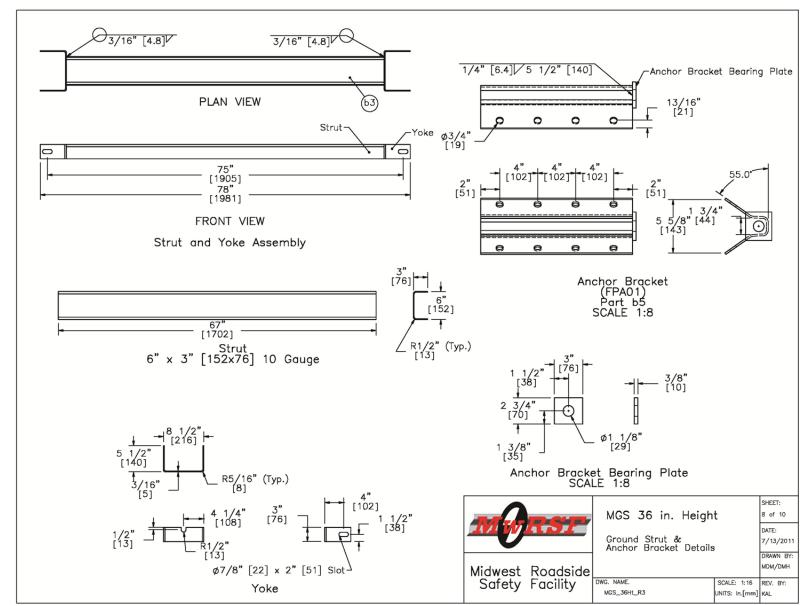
Ground Strut and Anchor Bracket Details, Test No. MGSMRH-2
